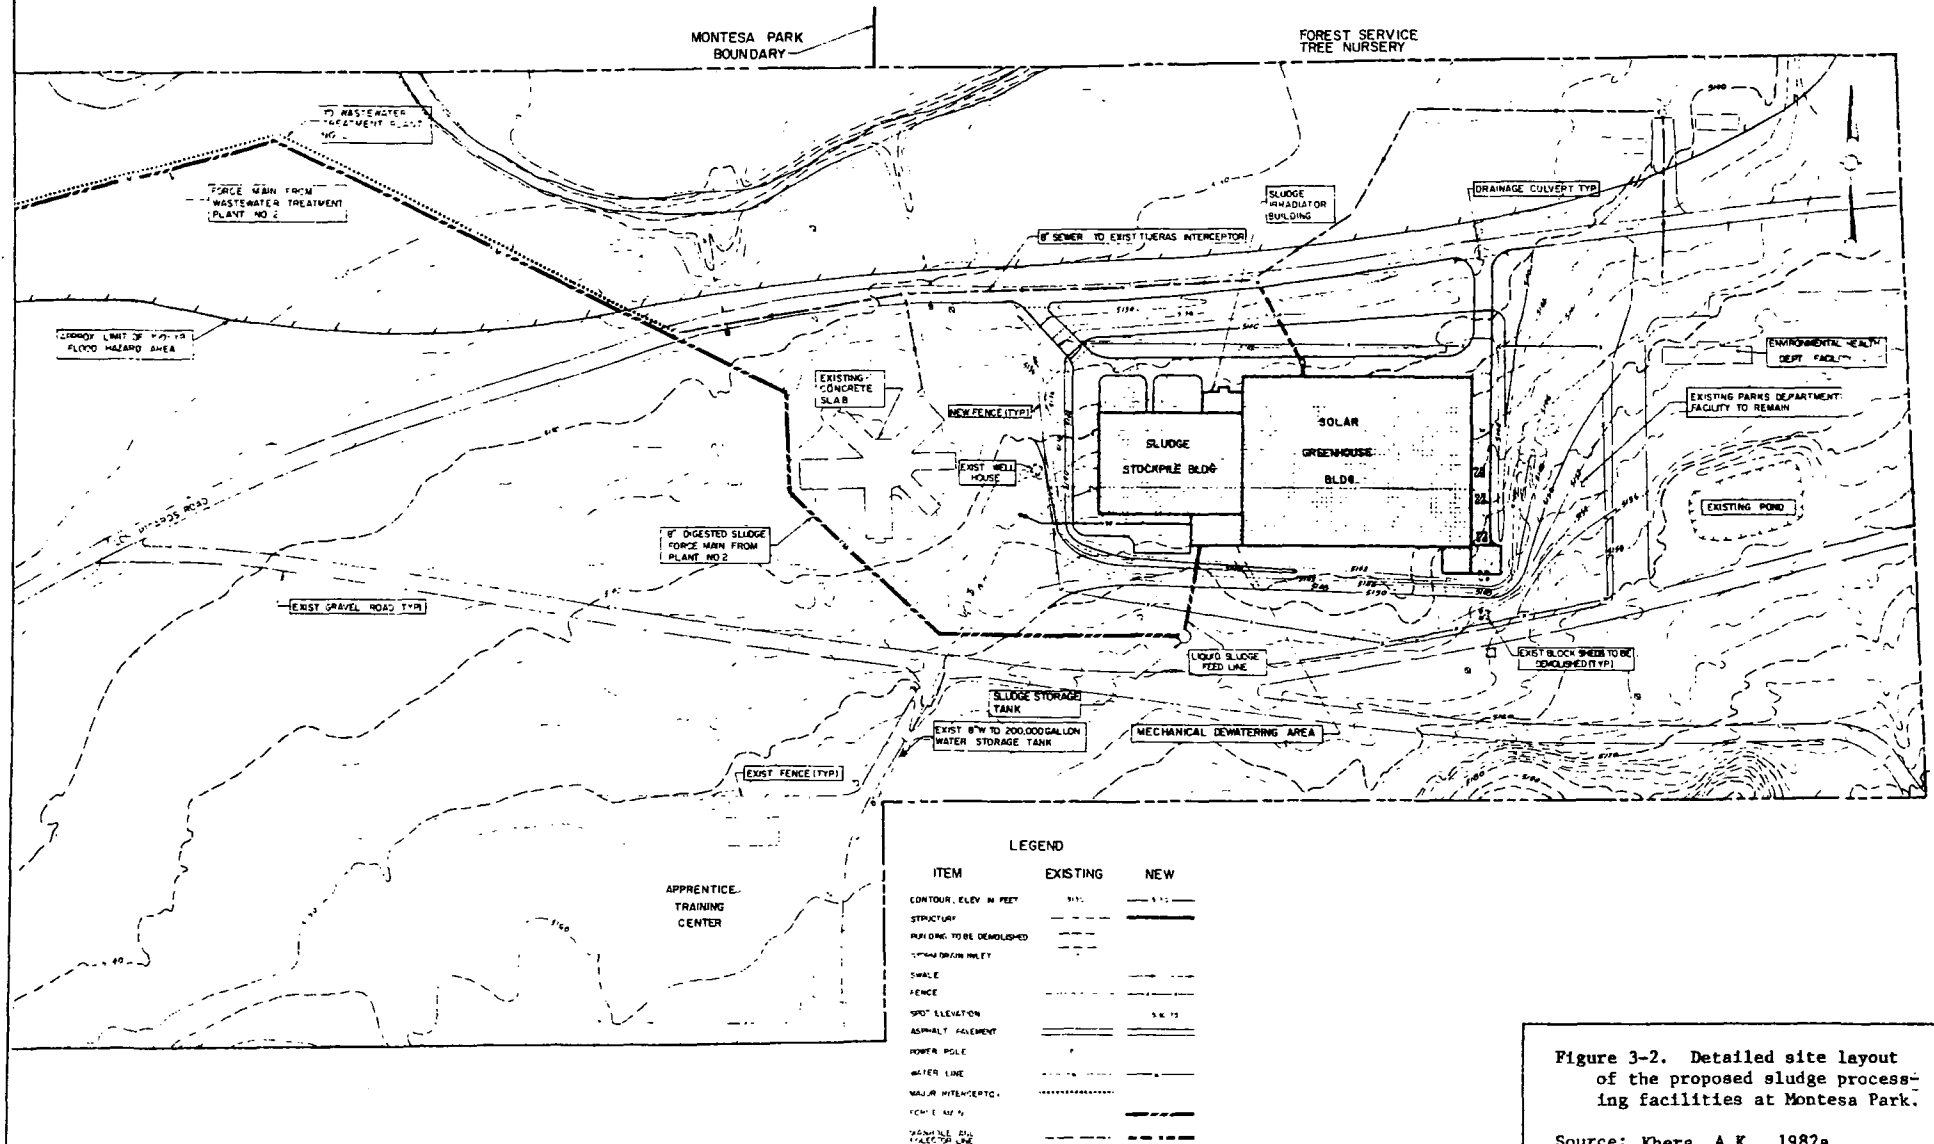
Detailed site layout of the proposed sludge processing facilities at Montesa Park.
